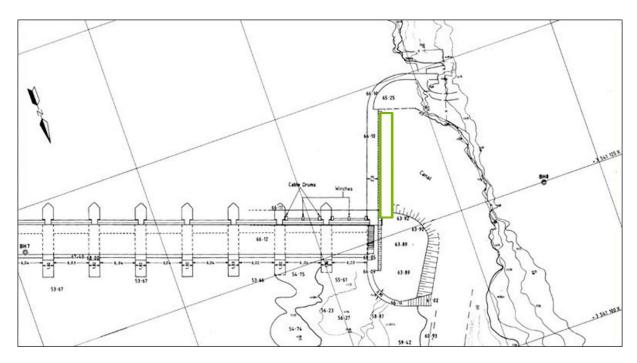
Plan view of Bulshoek Weir showing existing outlet structure (green)
